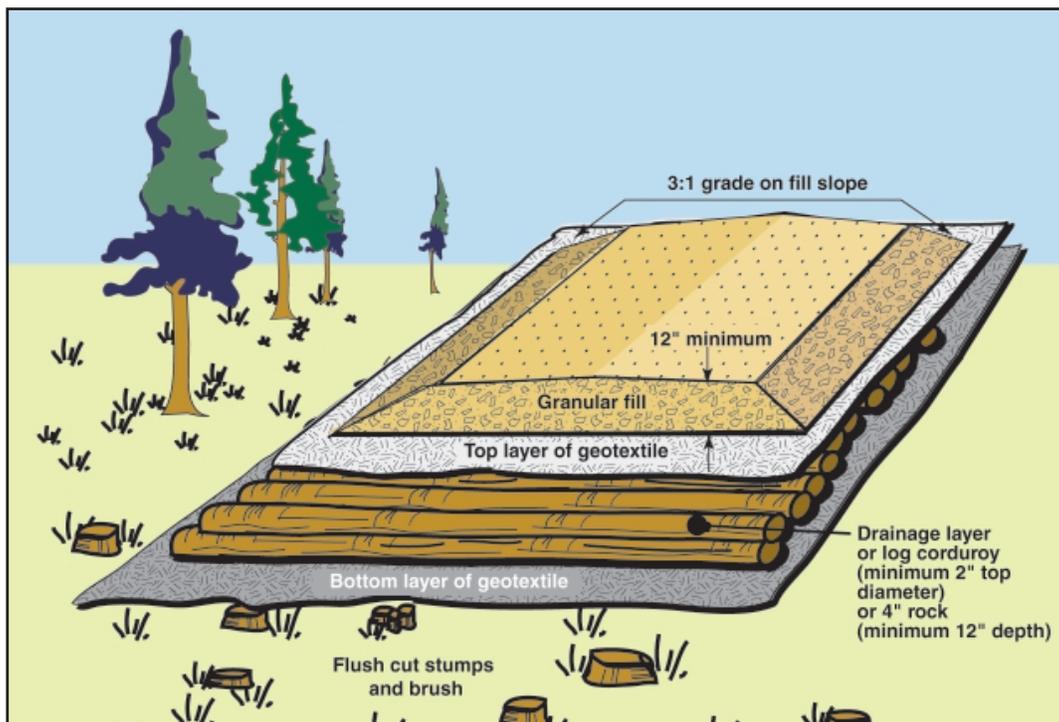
Road design for peat wetlands with continuous cross drainage. Drainage layers may be used as an alternative to culverts, or in combination with culverts, to provide adequate cross drainage.
